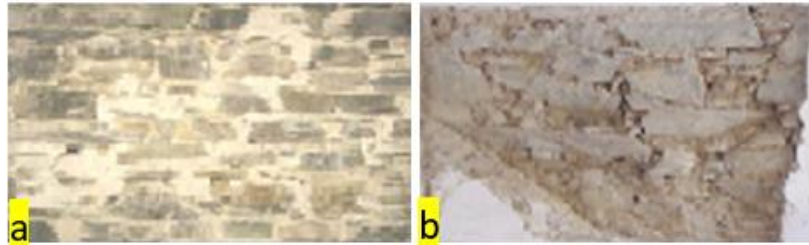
Masonry stone types of construction: a) lime joint walls and b) small stone walls in the clay joint
